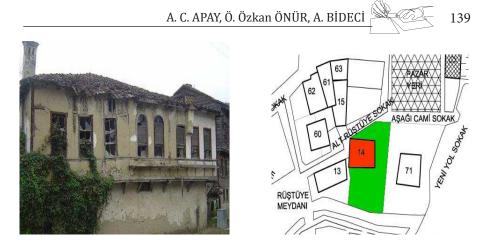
Hacı Rıfatlar Mansion's view and plan example
